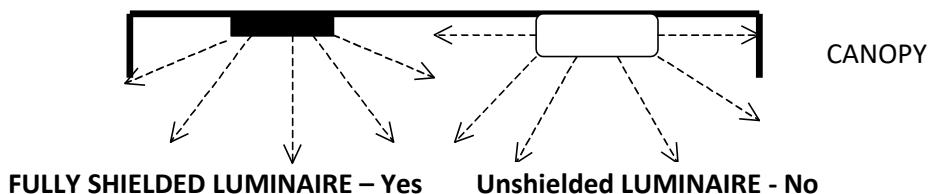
Building canopies, overhangs, roof eaves and similar types of construction shall not be considered as the means for providing the light cutoff. The cutoff characteristics shall be achieved by the luminaire itself.
